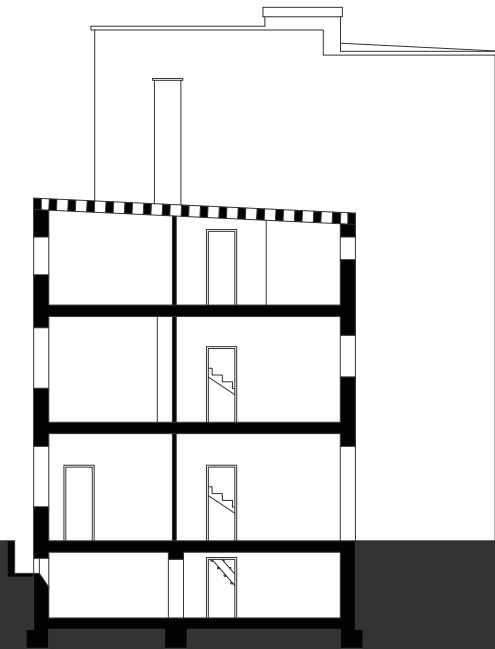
Section of single-family house, Hufeisensiedlung - 1:200
